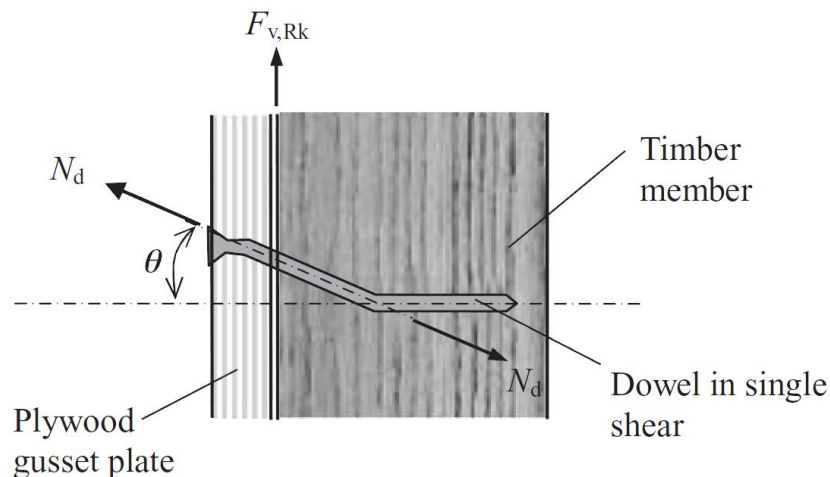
Example of a connection using a dowel type fastener (Porteous, J., Kermani, A., 2007)
